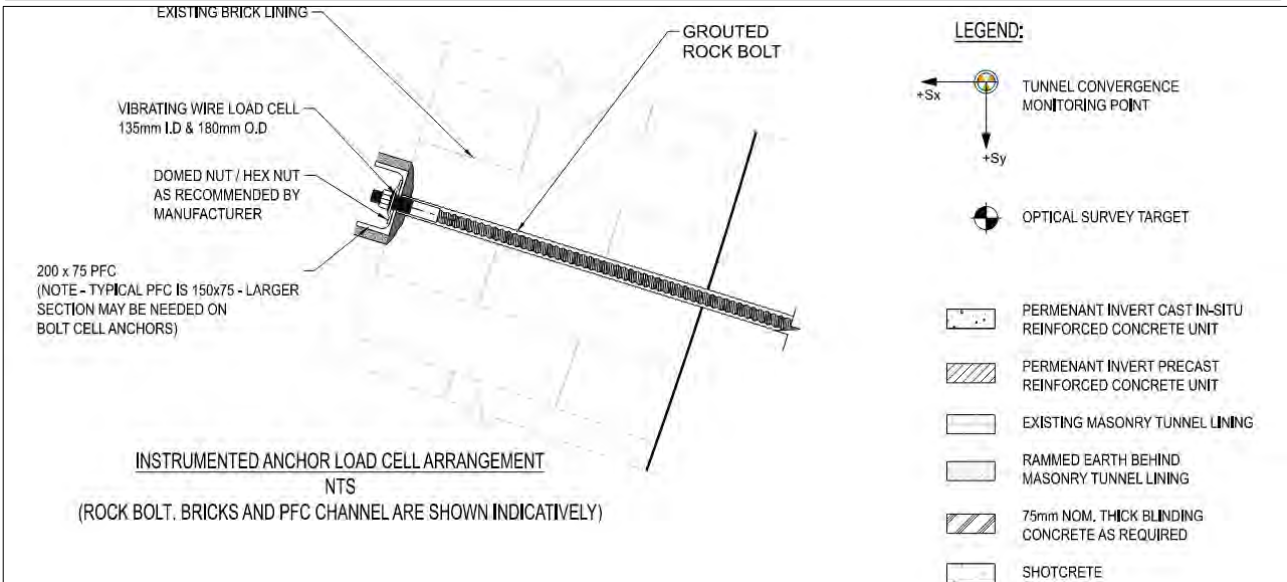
TYPICAL SECTION SHOWING PROPOSED INSTRUMENT MONITORING FOR ROCK BOLTS. (SOURCE: AURECON/VLINE)
